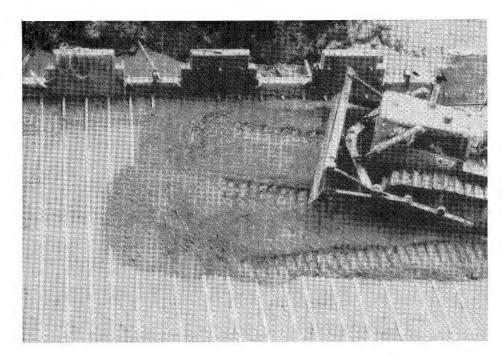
Typical precast concrete panels used in construction of mechanically stabilized backfill walls
